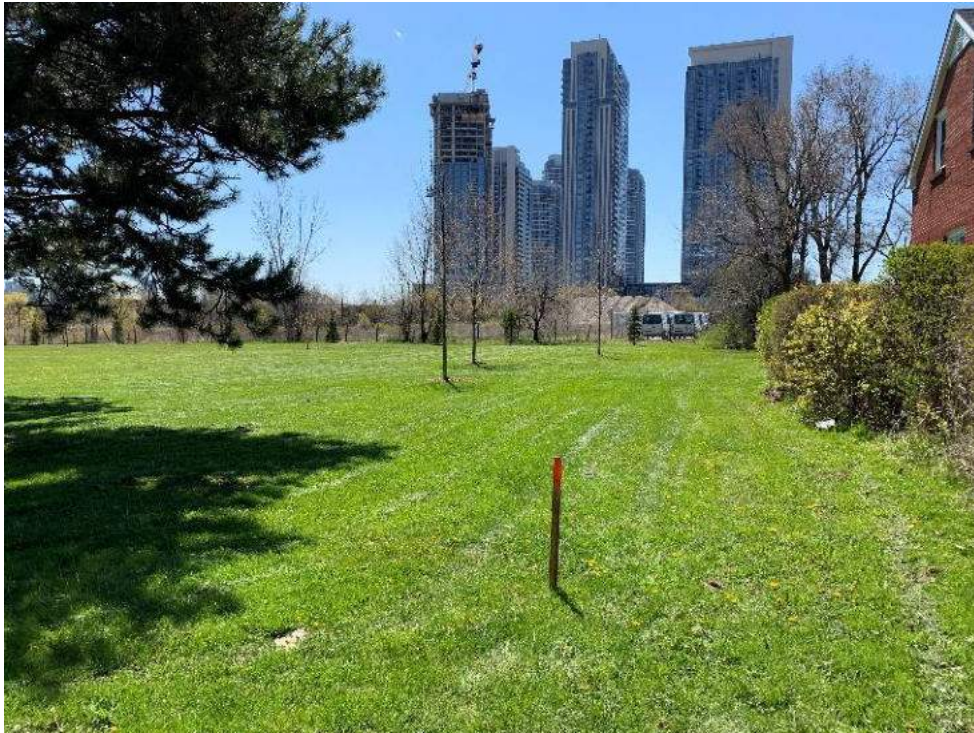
Location of BH 5 in Collingwood Park, looking south.
